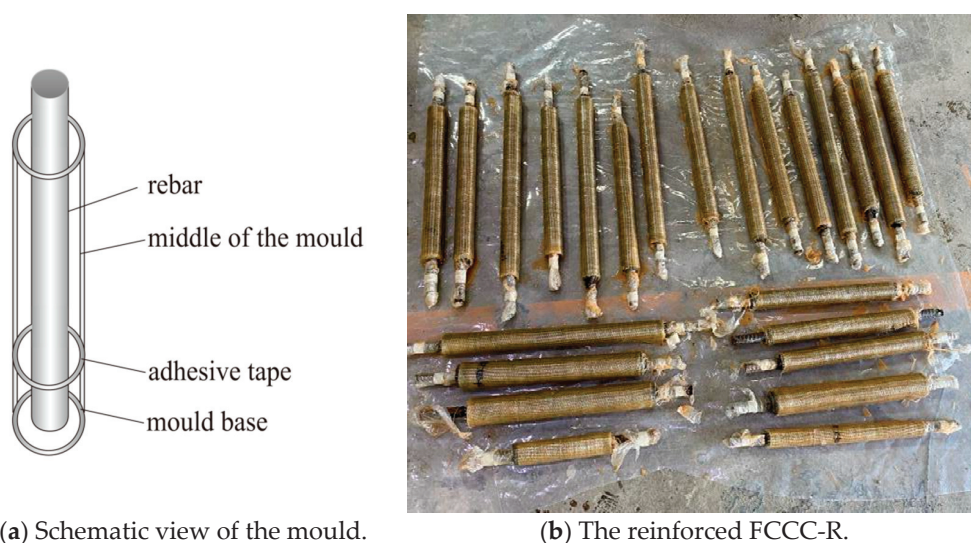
Schematic view of the mould and reinforced FCCC-R specimens.
